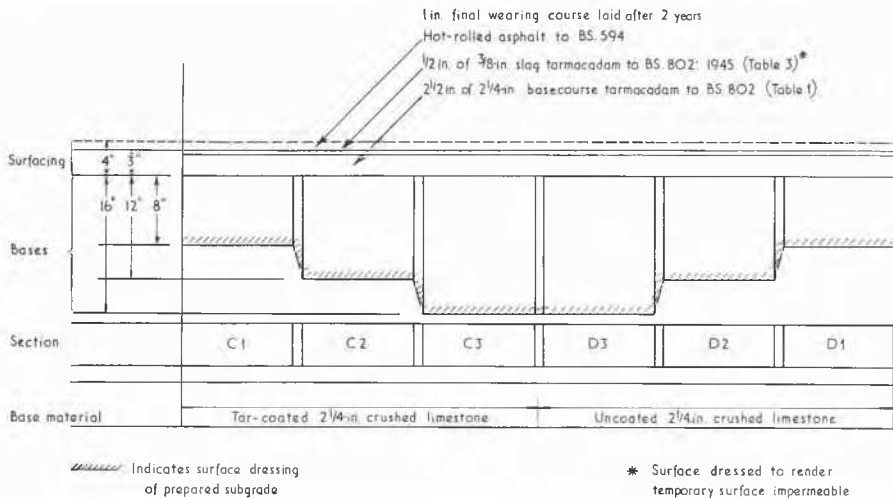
Layout of the experimental sections. Trunkroad A 4b.
